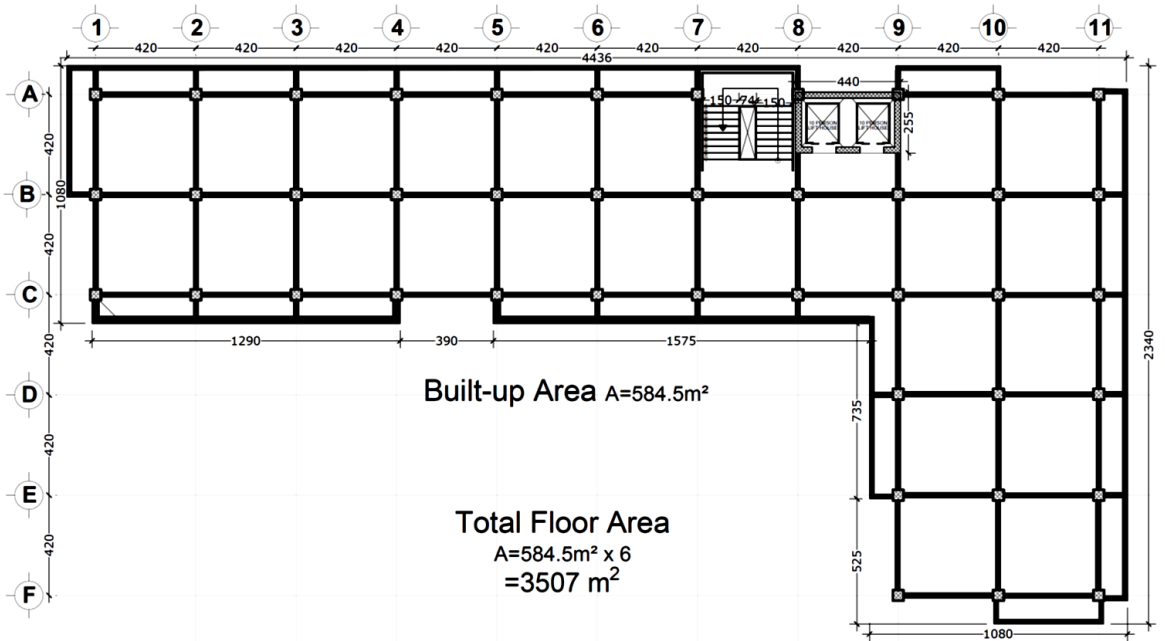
Typical Floor Plan of the Building used for Cost Analysis
